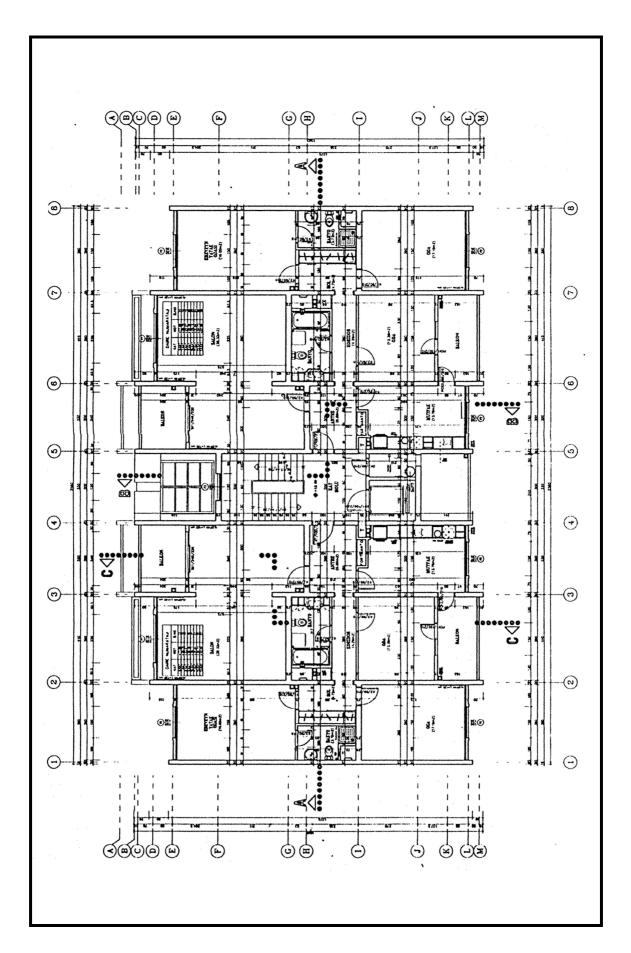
Mavişehir II; C Apartment Building 6th – 13th Floor Plan
